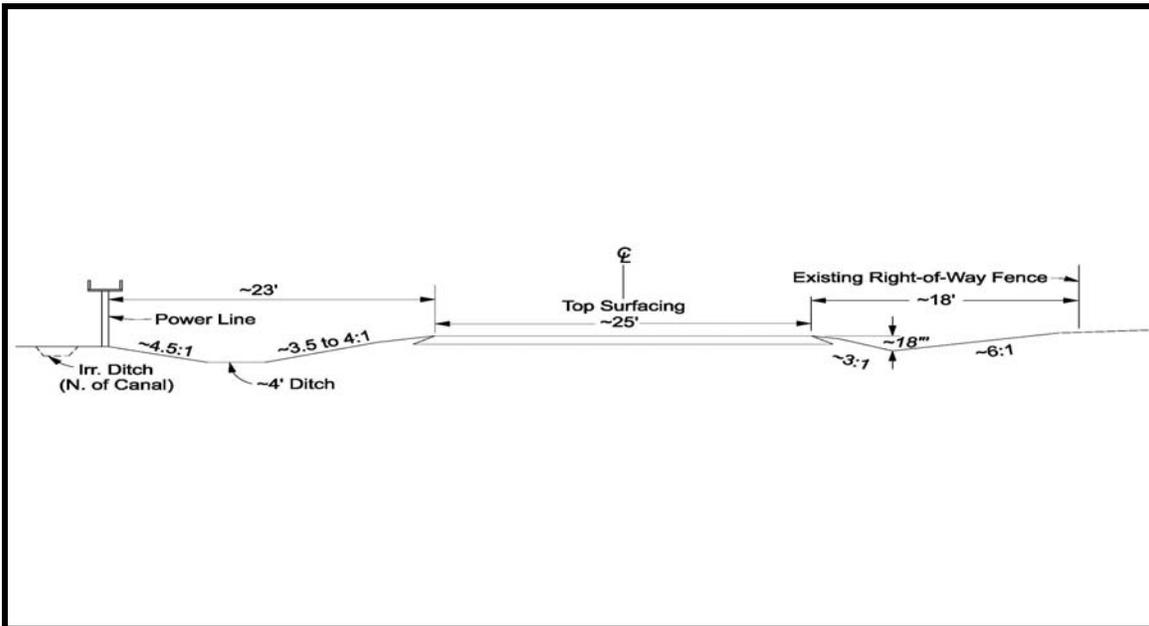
Existing Road Section Between Boundary St. and Canyon Ferry Road
